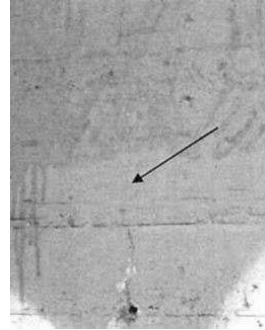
Abutment A0 – General view and vertical crack at the whole height
